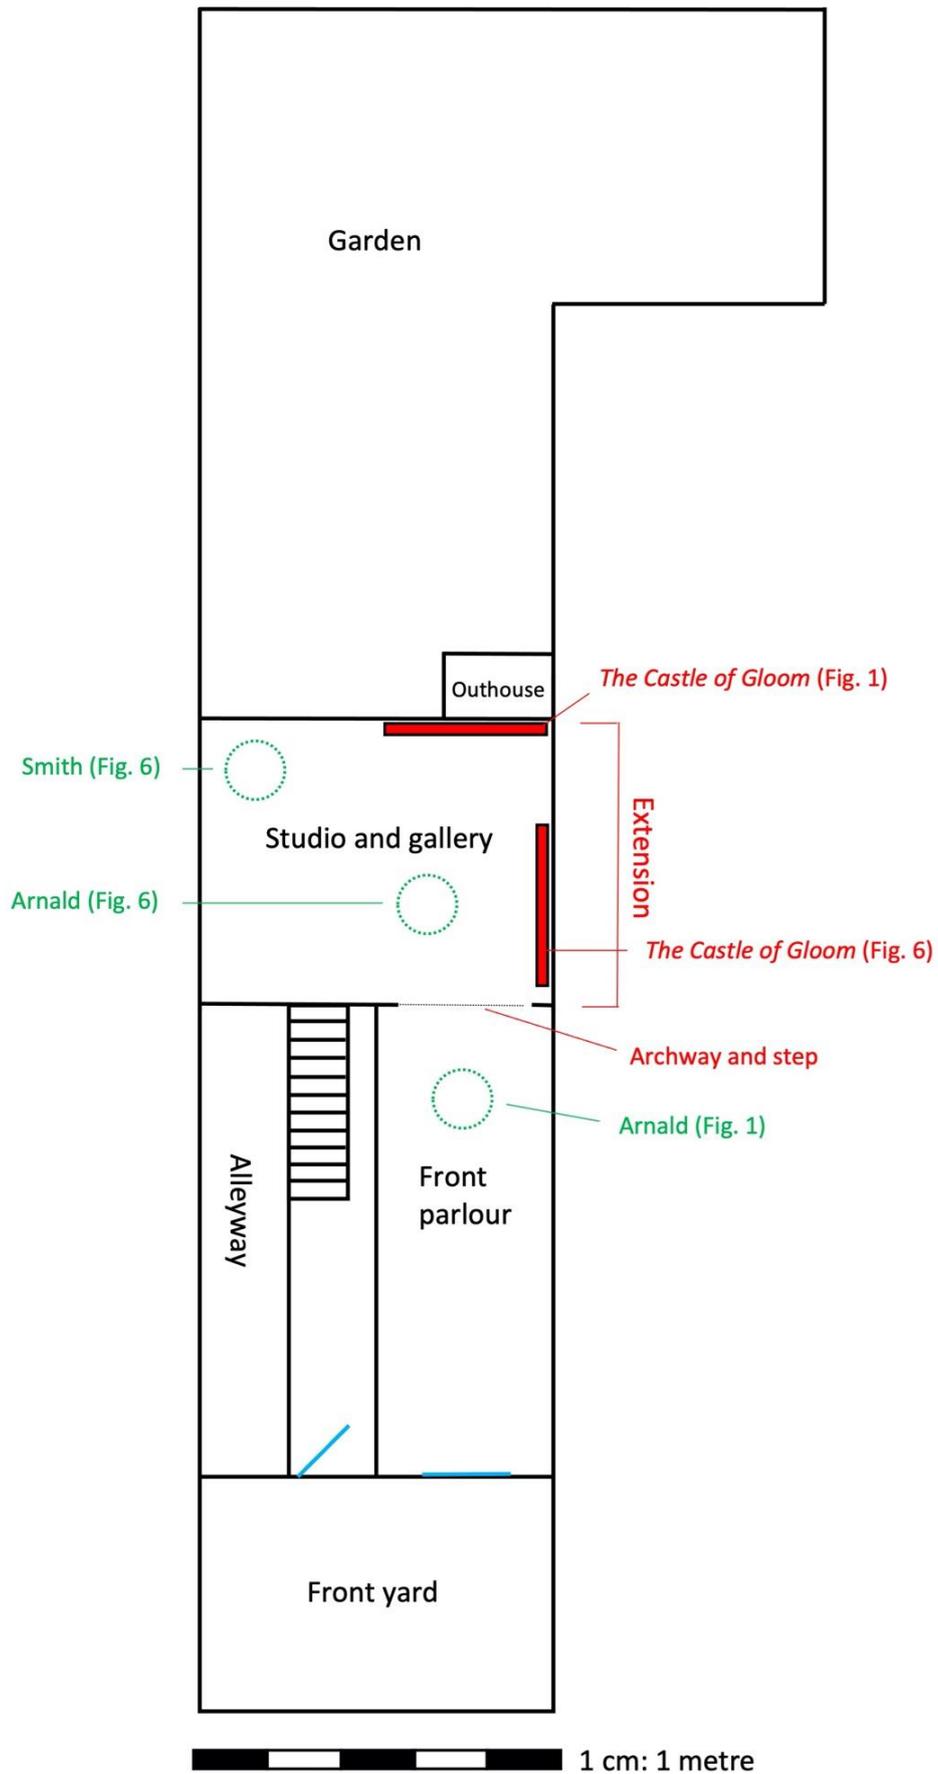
Author's proposed layout of the ground floor of 2 Weston Street, Pentonville during George Arnald's occupancy. © The author.
